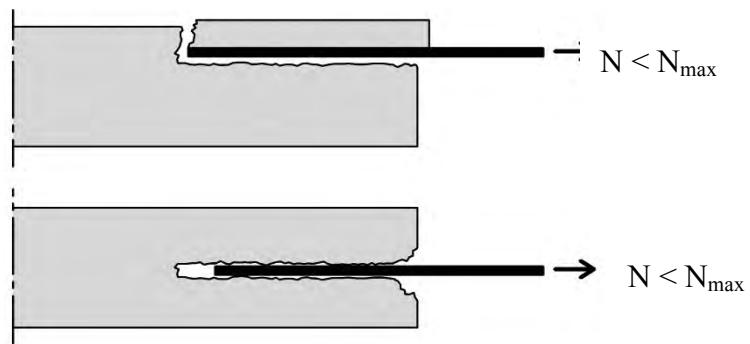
Anchorage failures of ribbed anchor bar with a. splitting failure and b. pull-out failure
